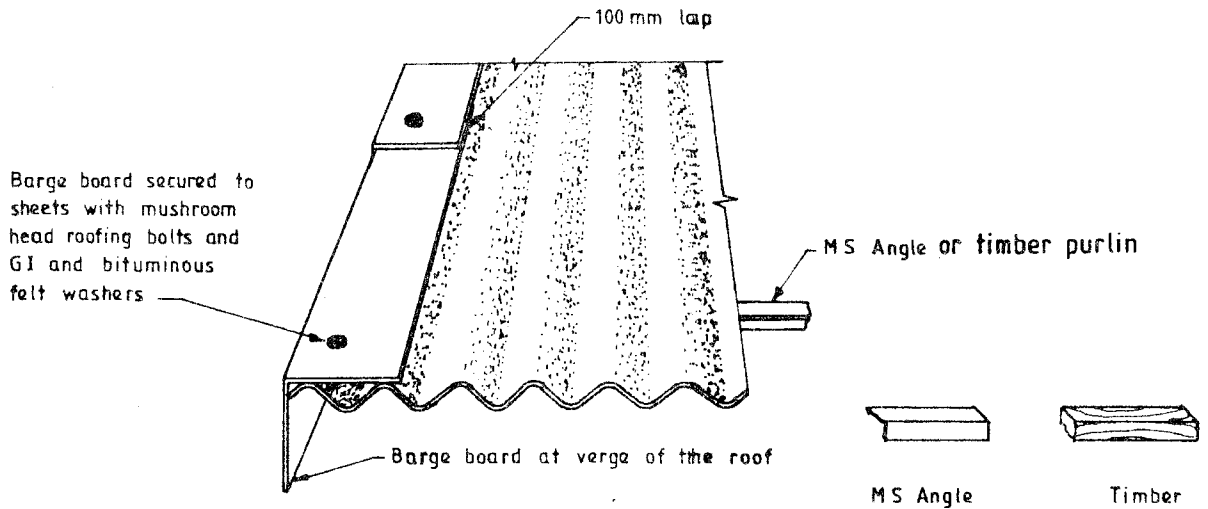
Typical details of bargeboard or corner piece (view from eaves)
